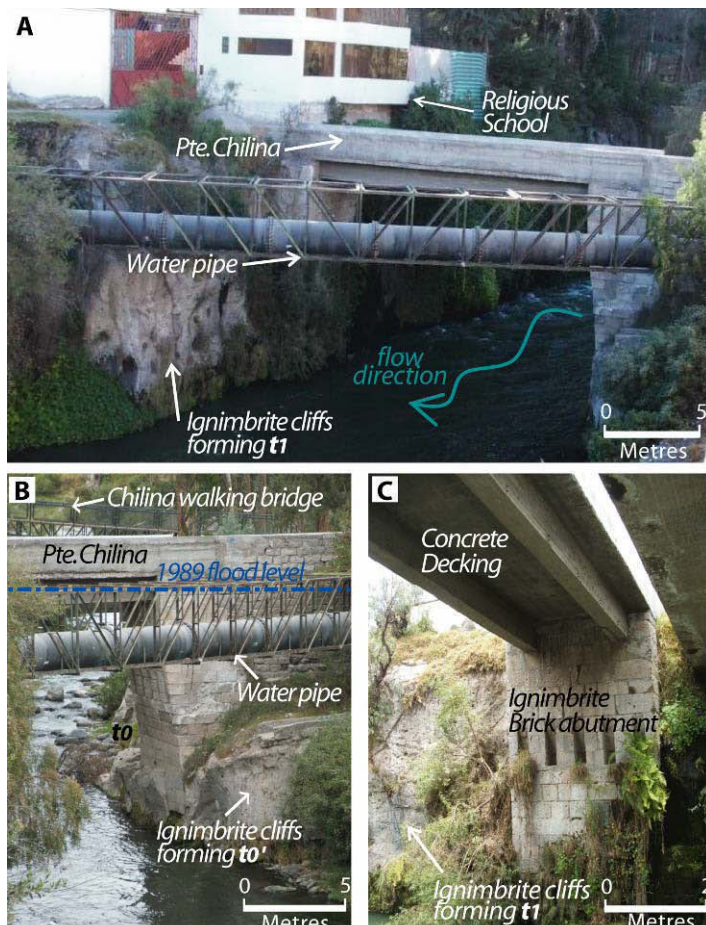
The ignimbrite masonry and cast in-situ reinforced concrete bridge at Chilina (North of Arequipa City). A: Downstream view of the bridge and pipeline from the Eastern bank. B: Downstream view of the bridge and a large pipe encased in a steel truss from the western bank. C: The underneath of the bridge with ignimbrite masonry abutments and concrete bridge span. To the right of the photograph is the reinforced concrete casing of the upstream pipe.
